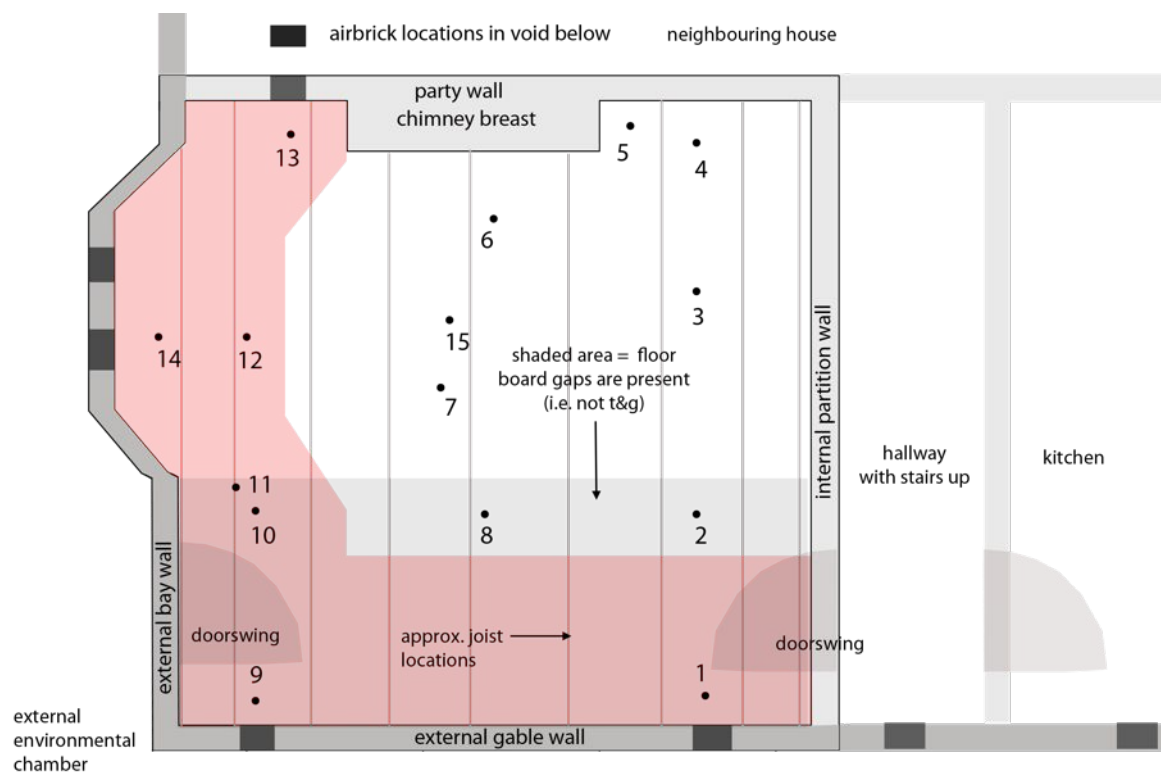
Salford EH living room plan and in-situ point measurement locations; note that sensor location 11 was on a joist. The red zone indicates a 1000mm perimeter zone in the living room.
